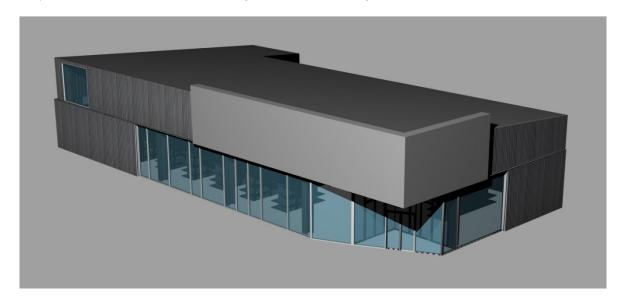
Case Study #1 – Typical Hot-Rolled Steel Structure Single-Storey Retail Building
